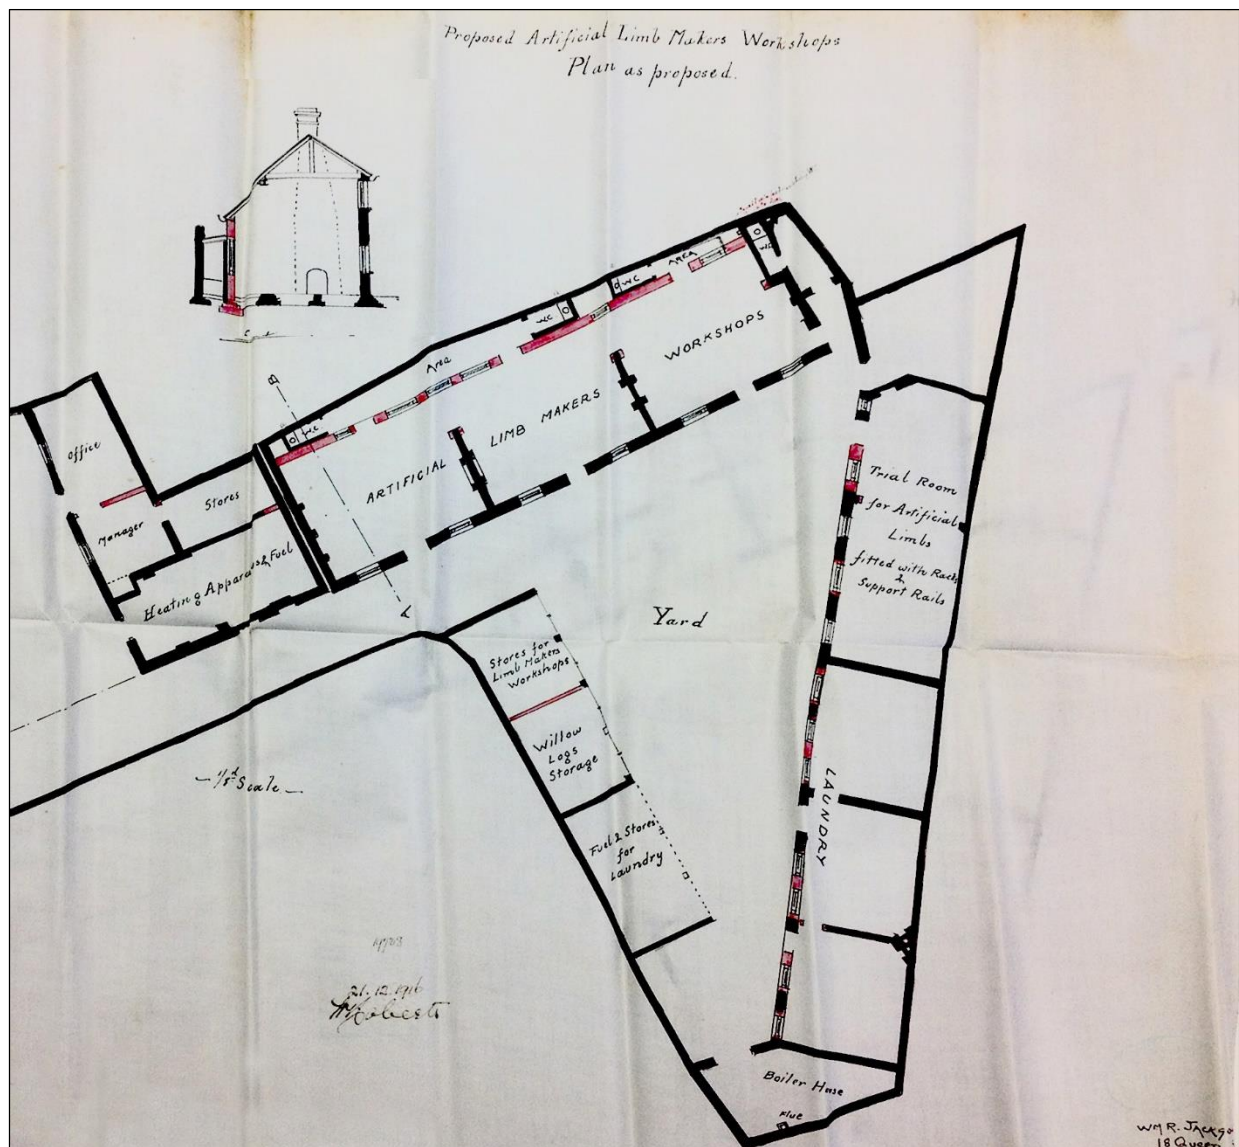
Plan showing internal layout of PRN 05133s (Glamorgan Archives BC/S/1/19738).
